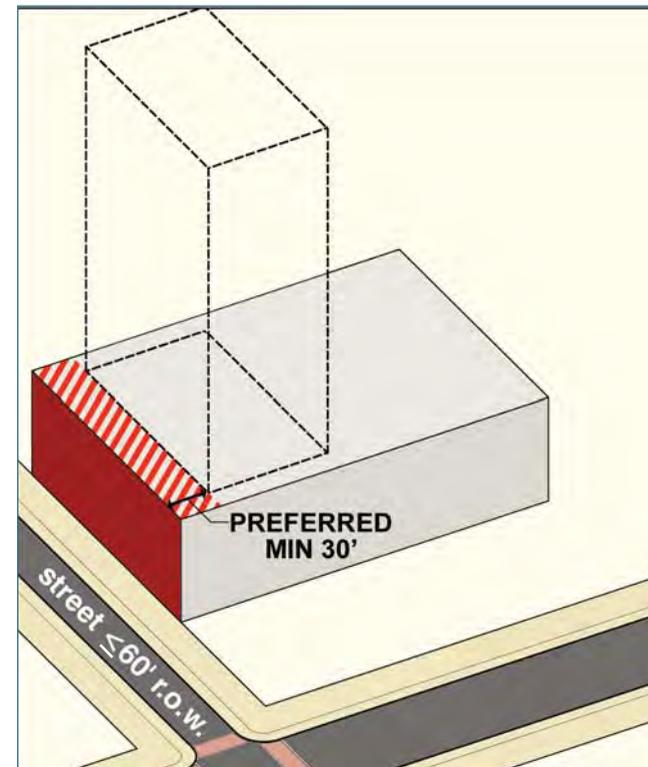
Example of a non-tower building on a narrow street. When towers do occur on narrow streets, they are encouraged to have additional shoulder setbacks (\leq or = 60 ft.wide) to reduce:
